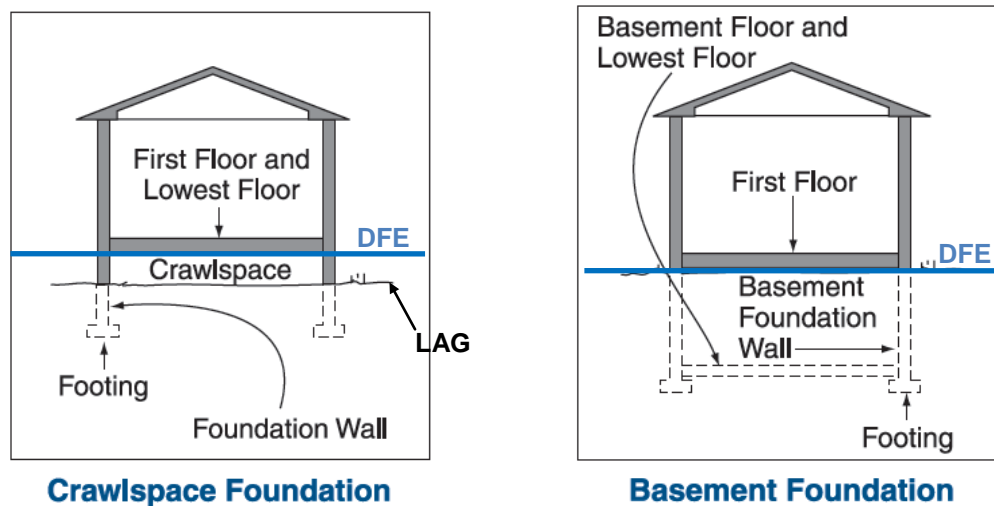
Example of Crawlspace Flooding (left) and Basement Flooding (right) – DFE is Design Flood Elevation (Source: FEMA P-312)
